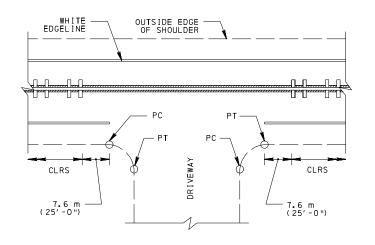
TYPICAL DRIVEWAY SEE NOTE 6
